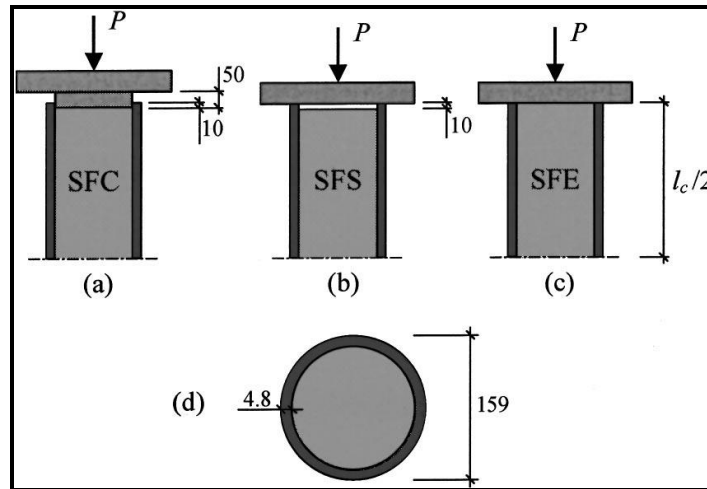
Three types of load application. Load applied to (a) the Concrete section, (b) the steel section, and (c) the entire section, (d) The section of the columns
